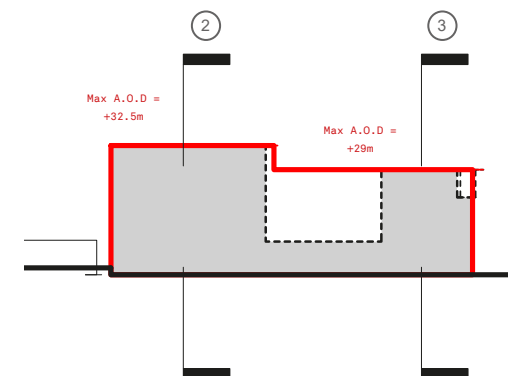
Long Section - 1 - Minimum and Maximum Parameters
